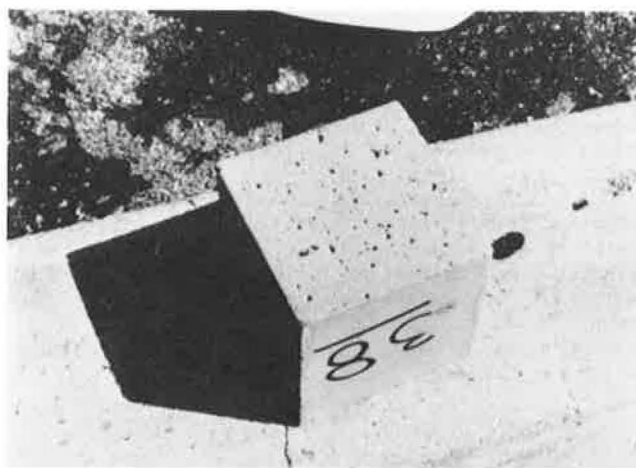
Concrete cube before (side surface) and after (top surface) light sandblasting.
